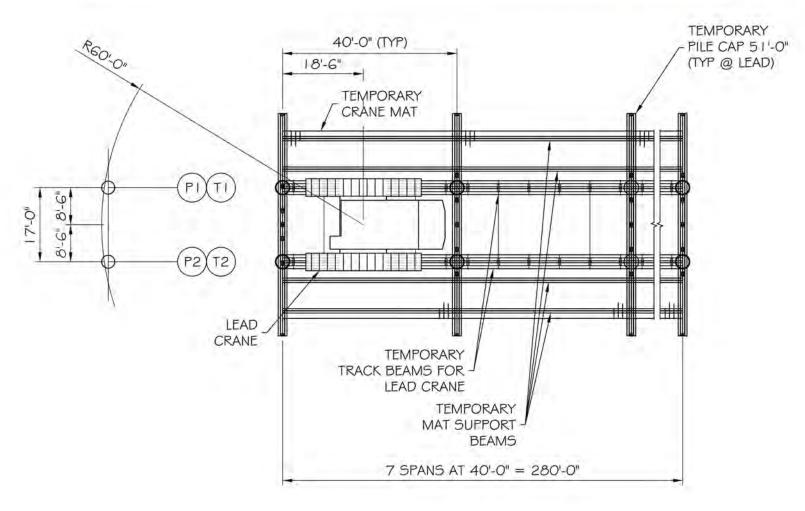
Partial Drawing of Leading Crane at span where piles are being installed.
